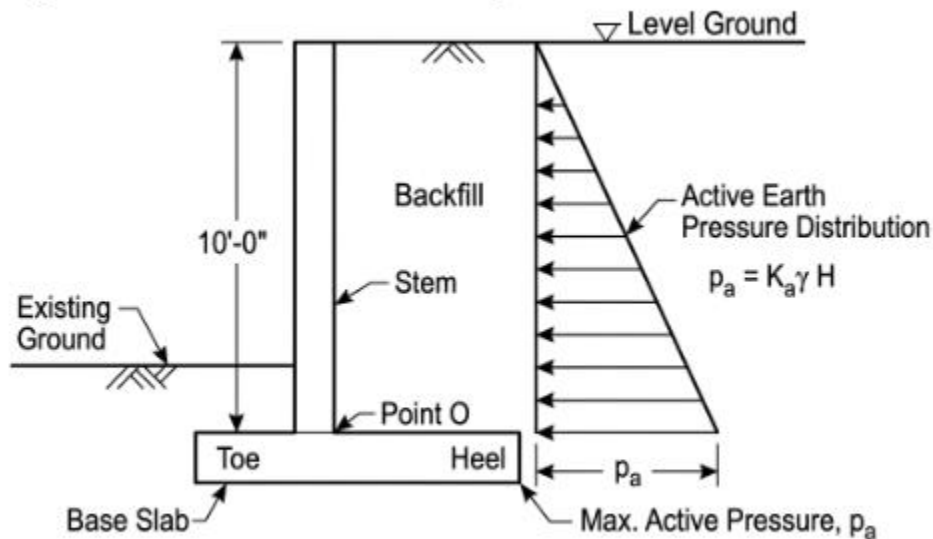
Cantilever Retaining Wall & Active Pressure
